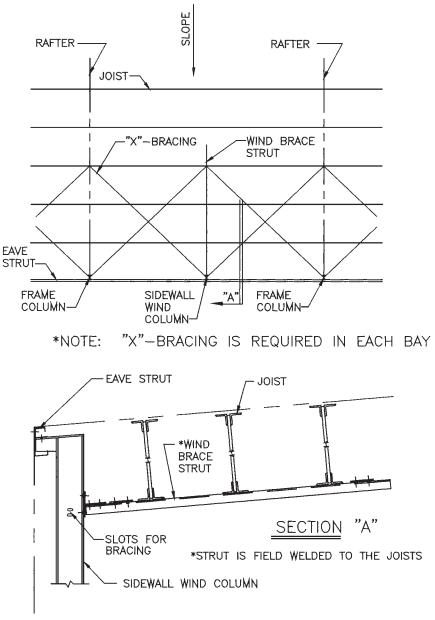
Lateral bracing for sidewall wind column. (Nucor Building Systems.)
